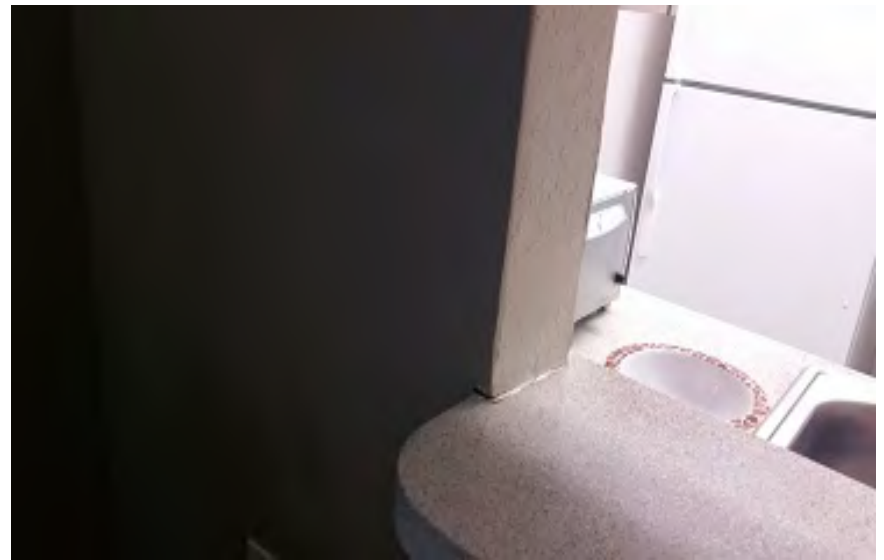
Unit 114: Wall Cracks near Closet
